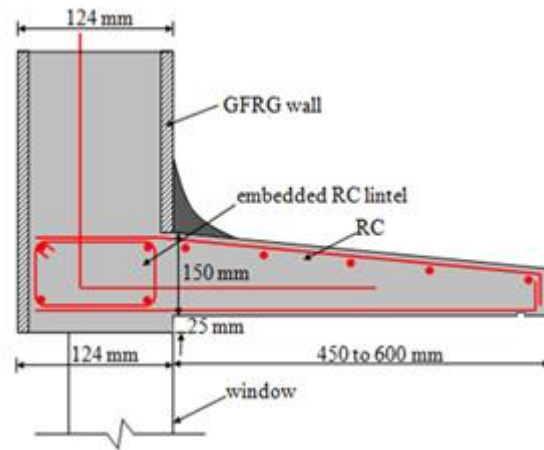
Reinforcement detailing for RC lintel cum sunshade
